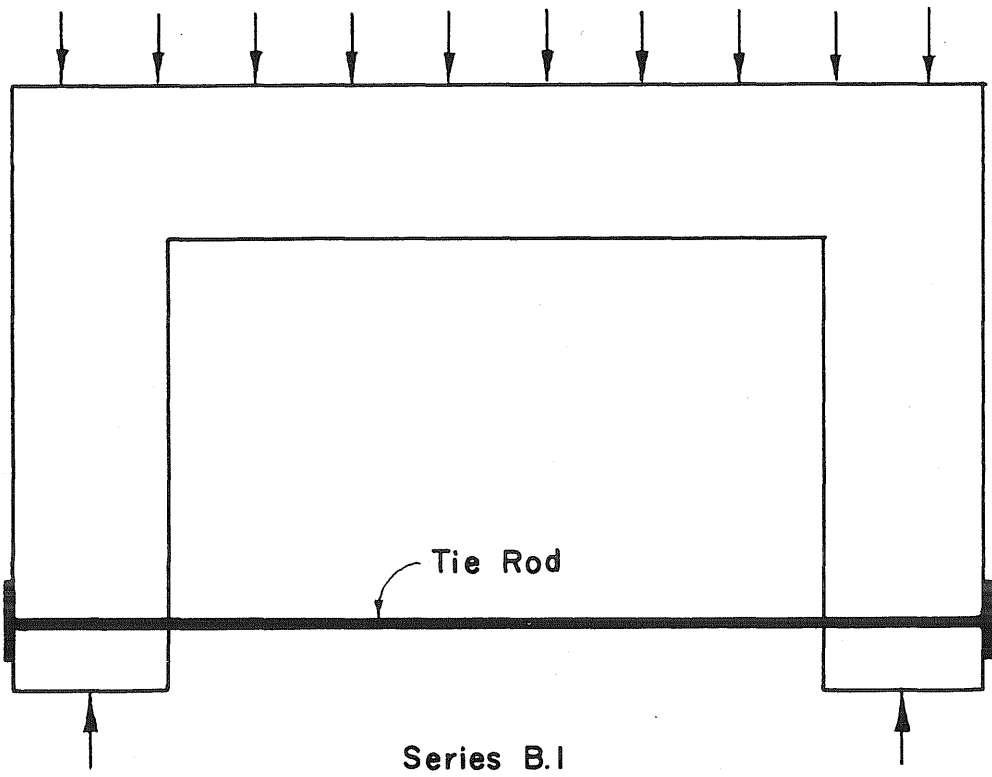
TYPE OF SPECIMEN PROPOSED FOR TESTS OF SIMULATED CULVERT SECTIONS
